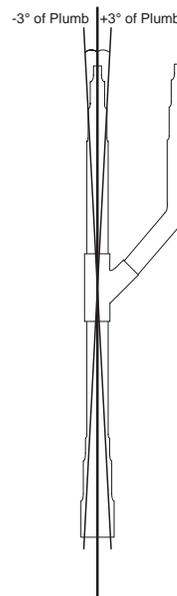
Outdoor Unit Y-branch Vertical Installation Alignment Specifications.
